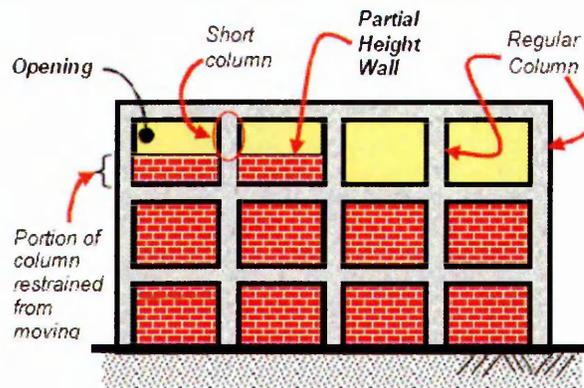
Short columns effect in RC buildings when partial height walls adjoin columns; the effect is implicit here because infill walls are often treated as non-structural elements (IITK-BMTPC, 2004)
